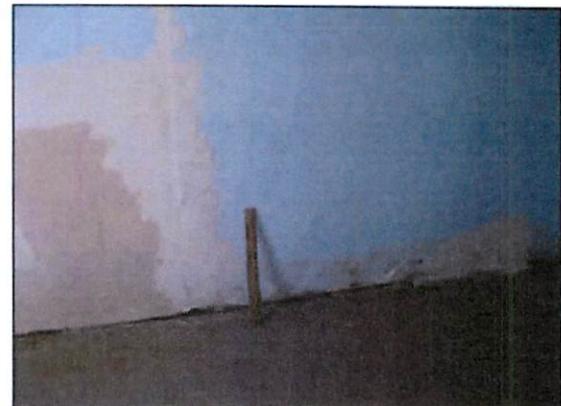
North wing, Room 6, evidence of previous wall repair/patch on exterior wall system
